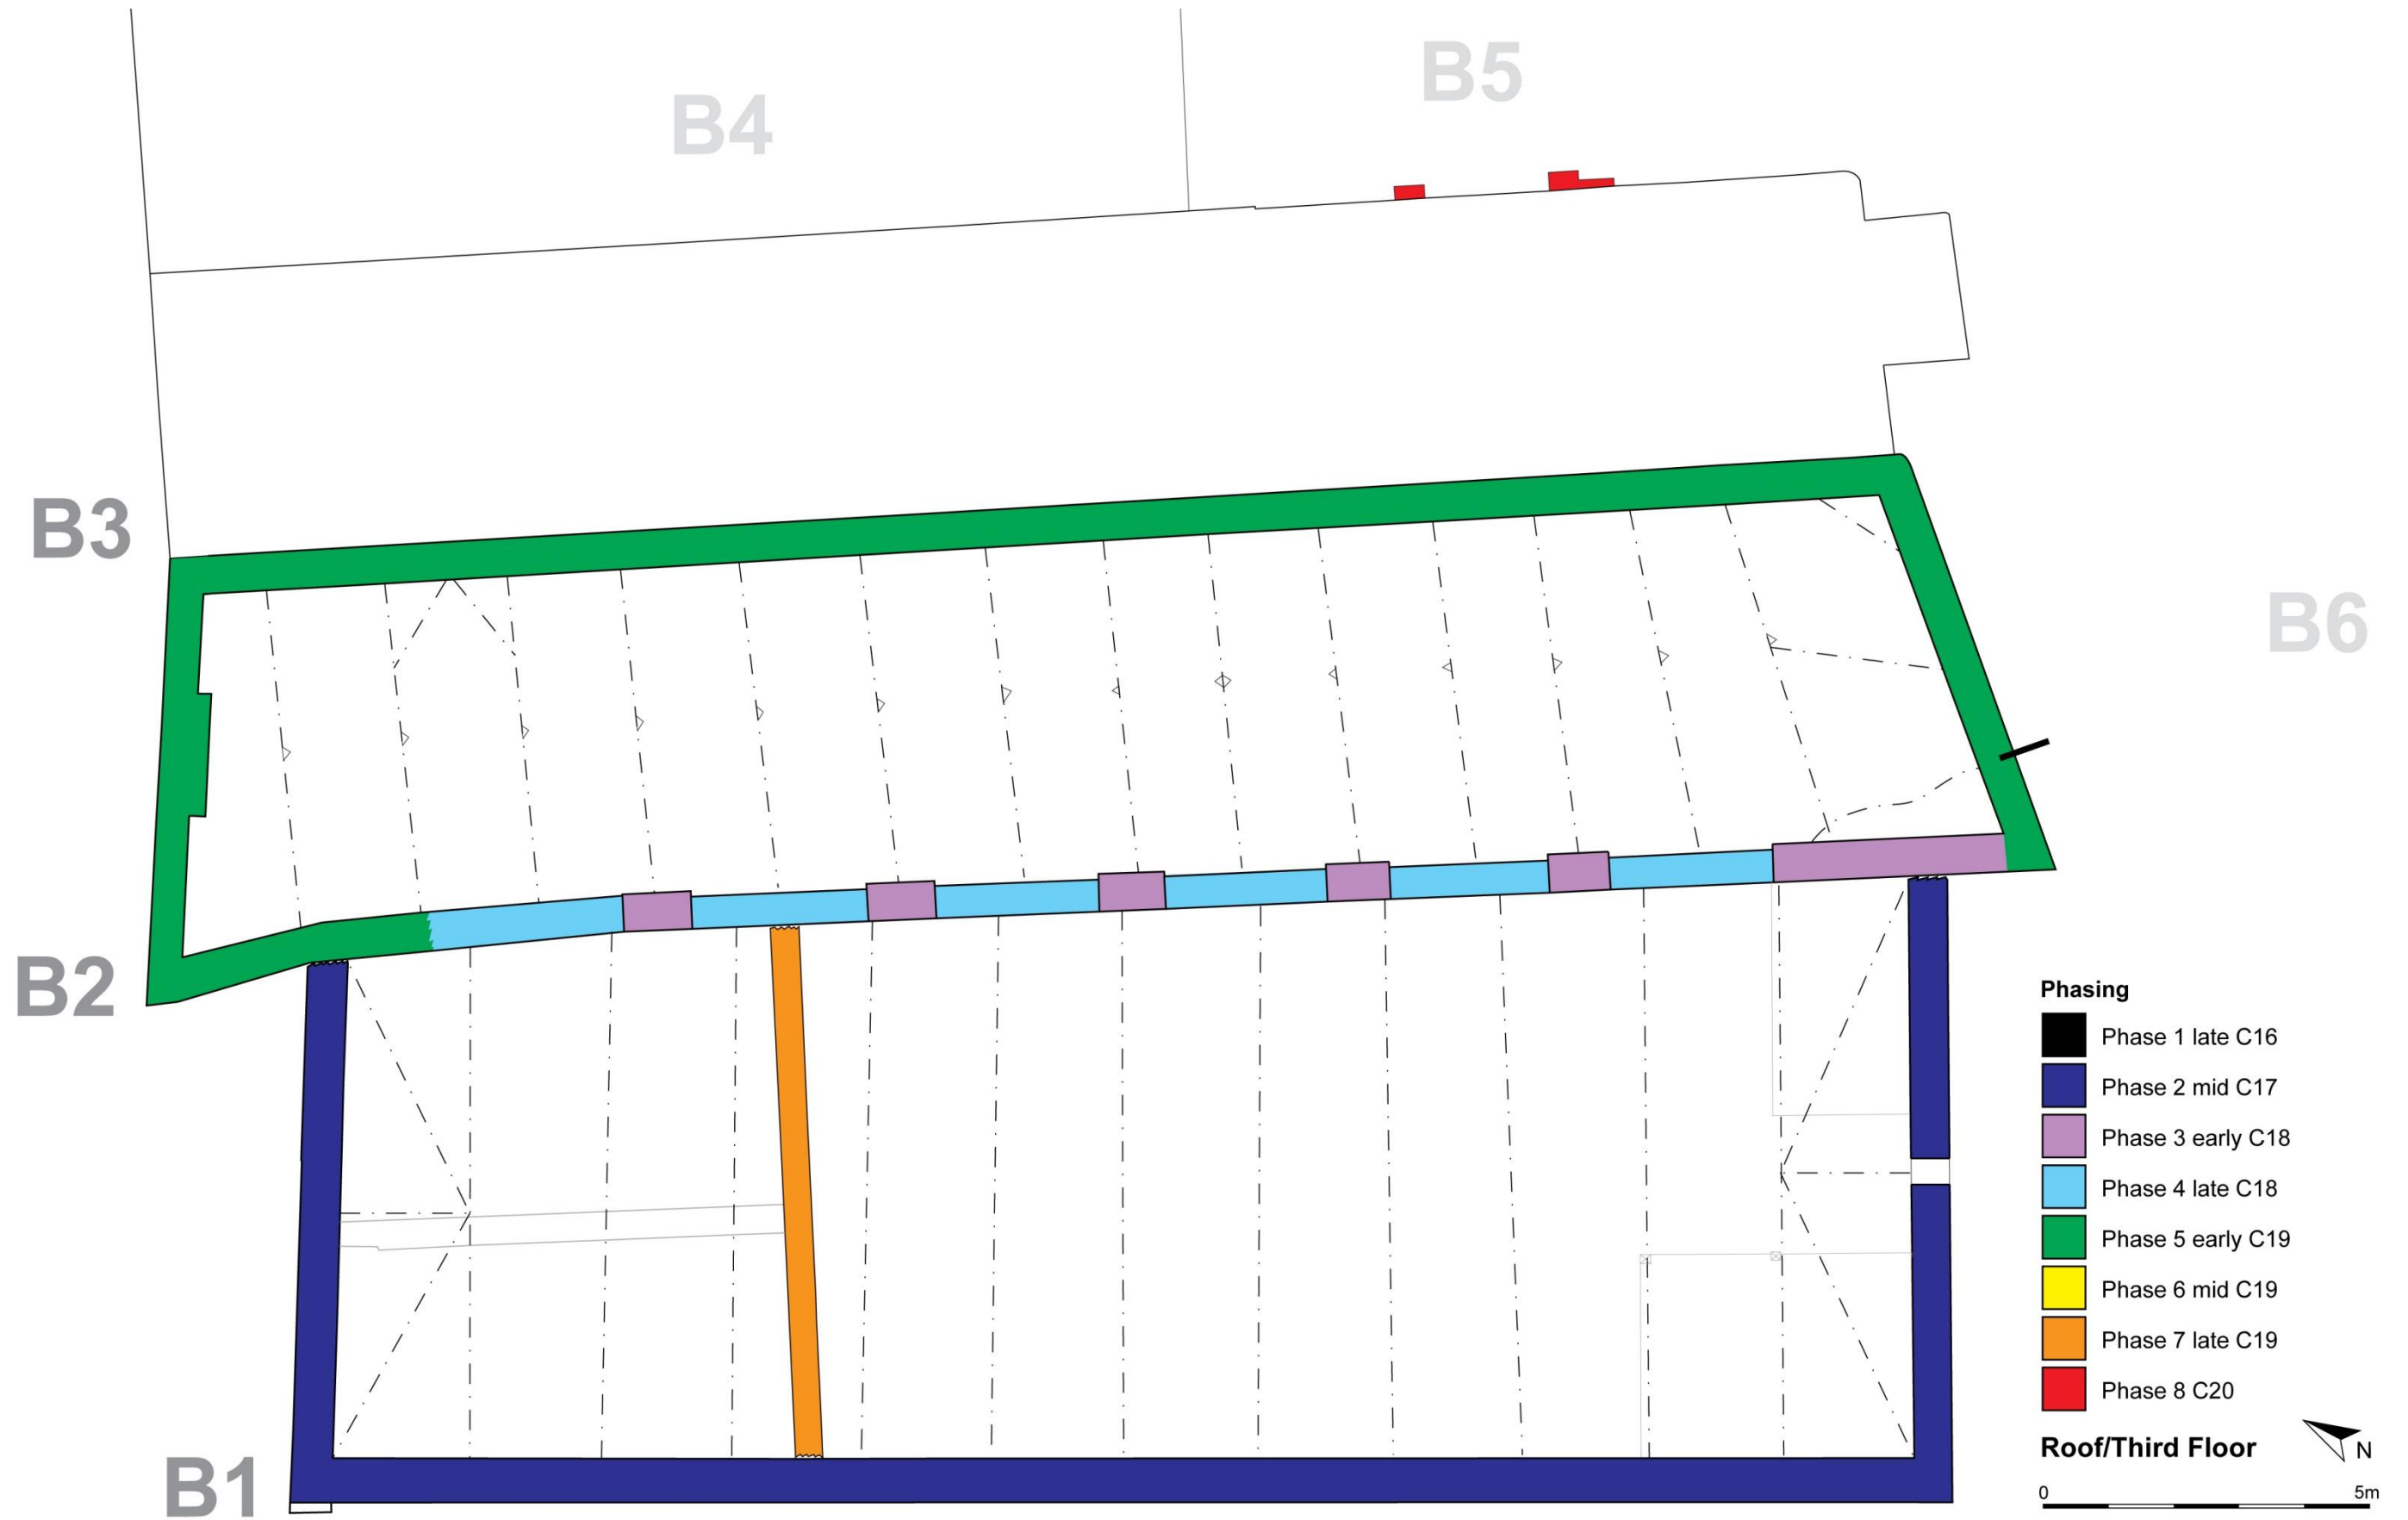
THIRD-FLOOR/ROOF SPACE PHASING.
